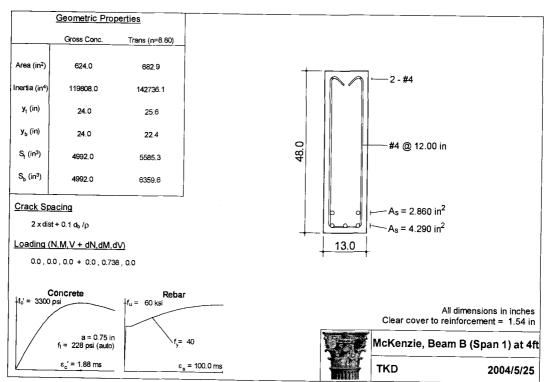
McKenzie R. Bridge; Span 1 at 4 ft. (RESPONSE 2000TM)
